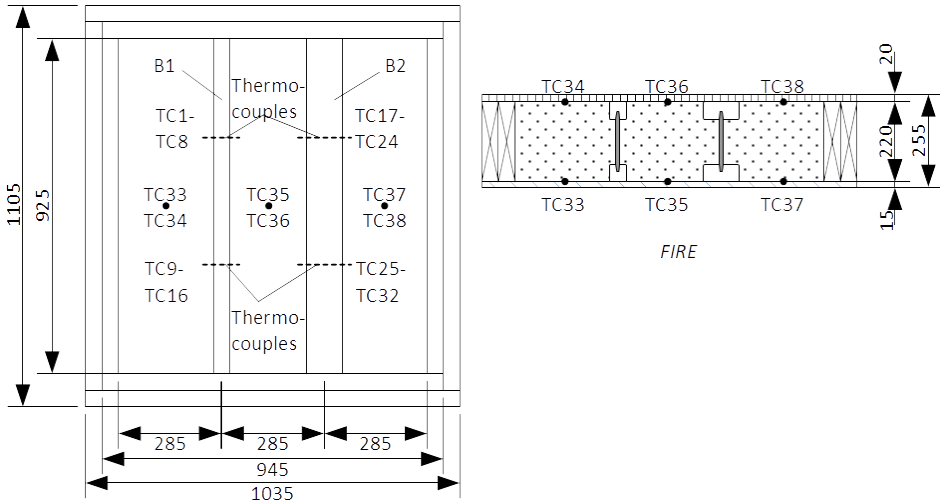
Plan (left) and section (right) views of the model-scale test specimen.
